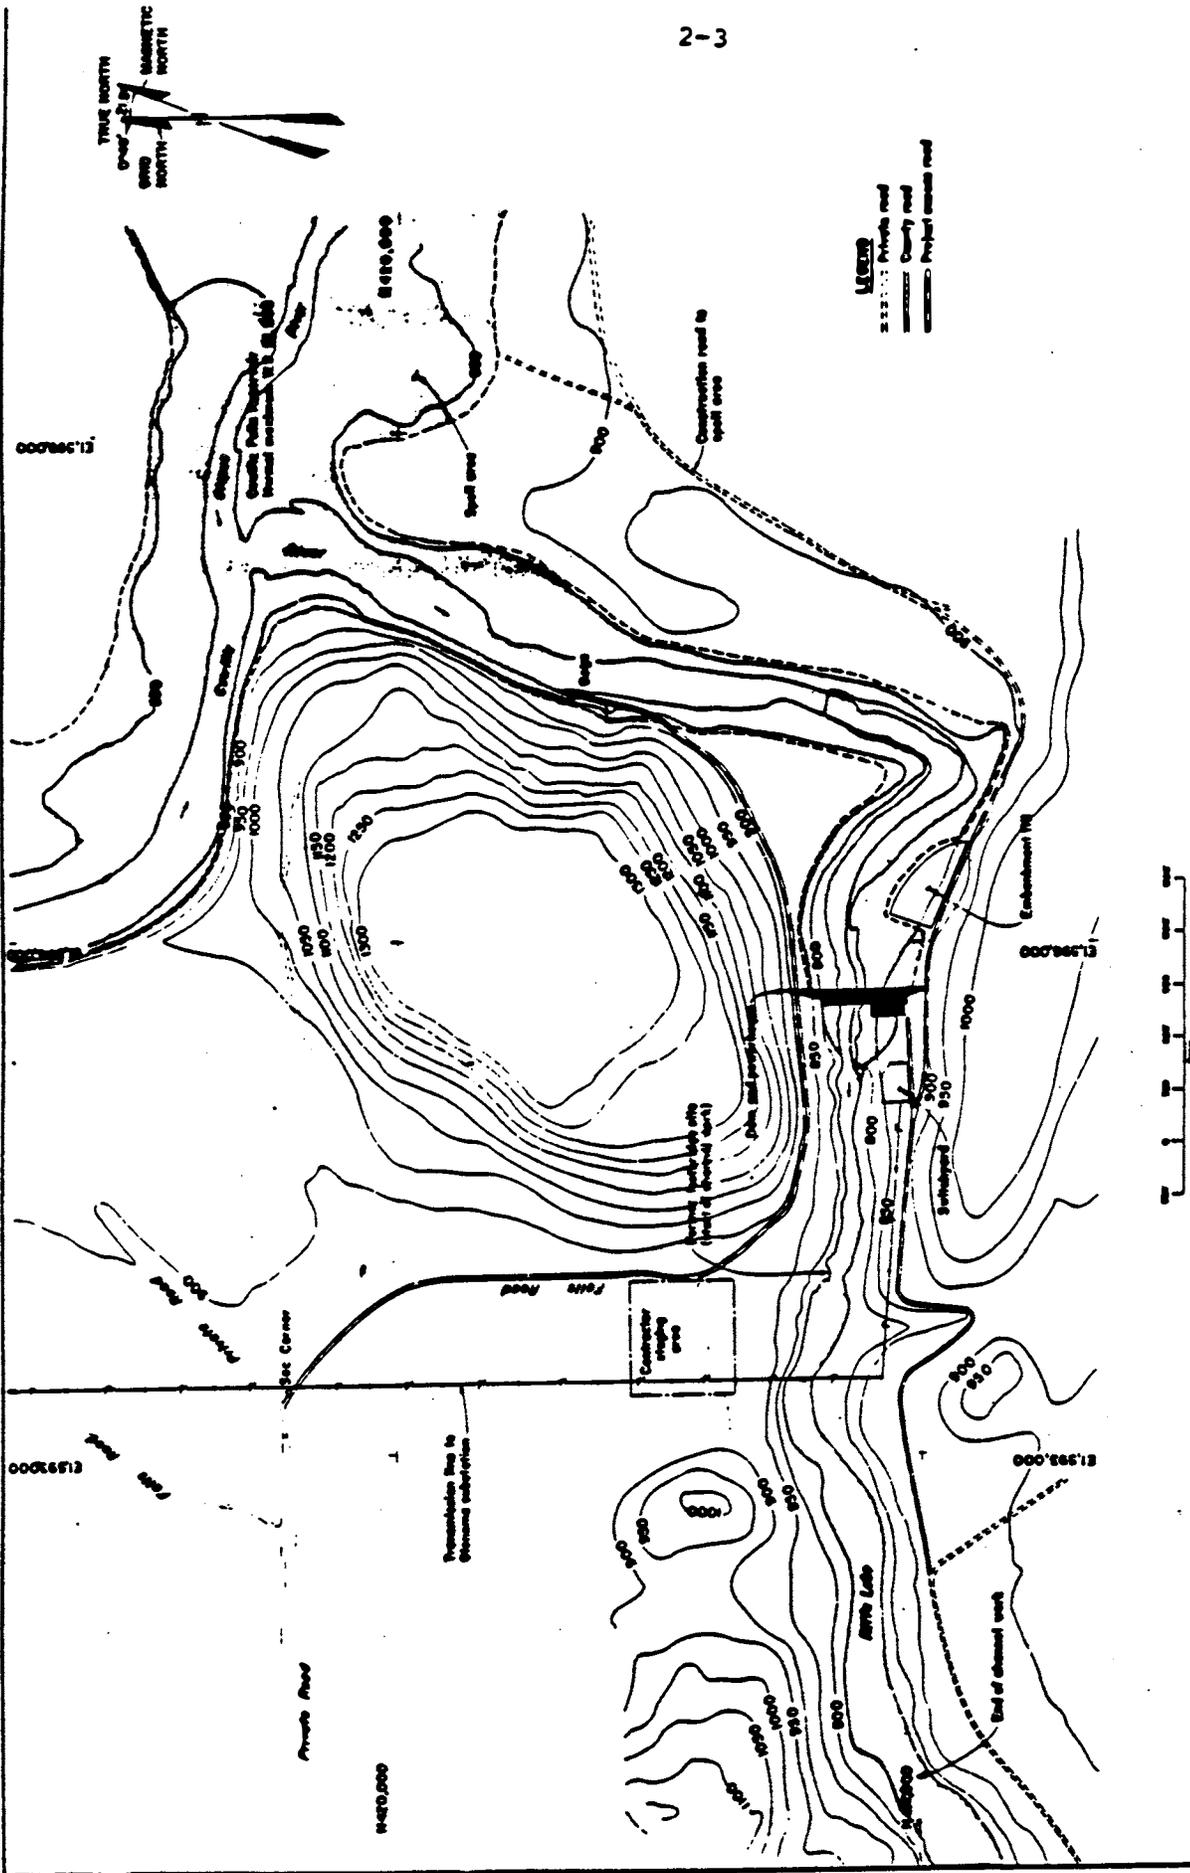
Proposed project facilities (Source: Application, Exhibit W).
